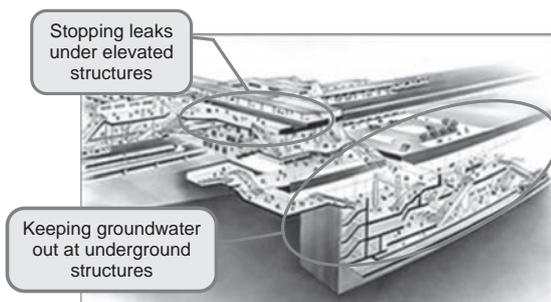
Application of Self-Healing Concrete to Railway Structure
